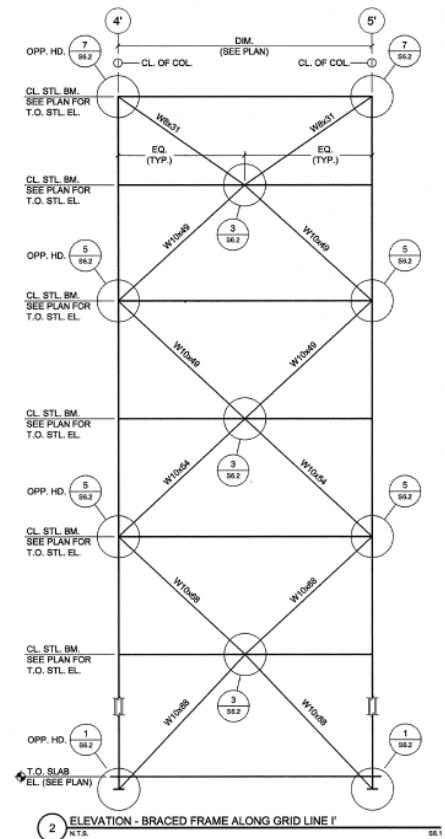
Braced frame elevation along grid line 1' between lines 4' & 5'
